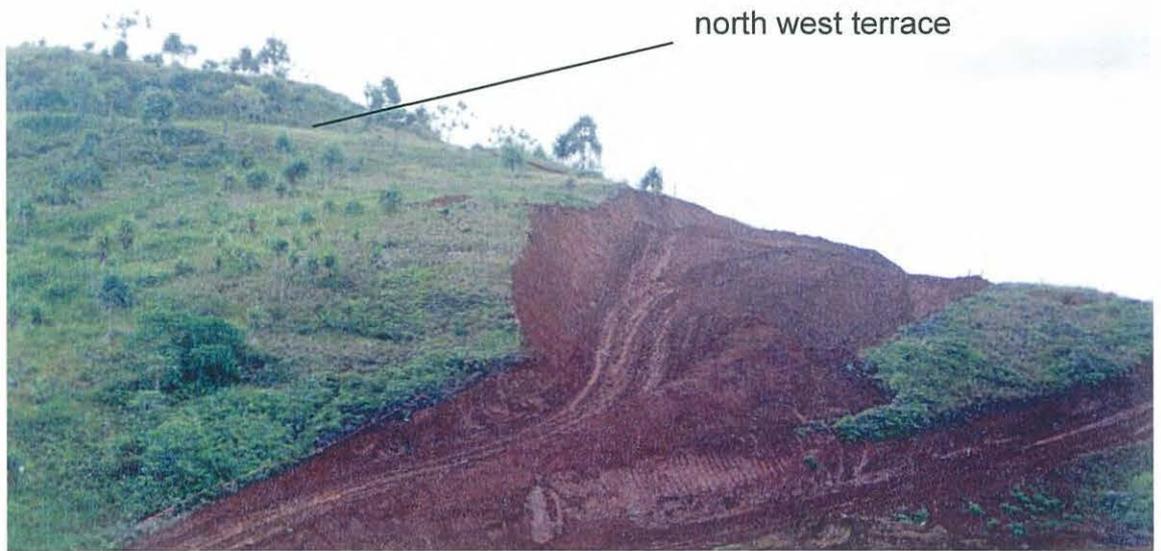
Excavations for the Compact Road cutting through the west extent of Toi Meduu.
